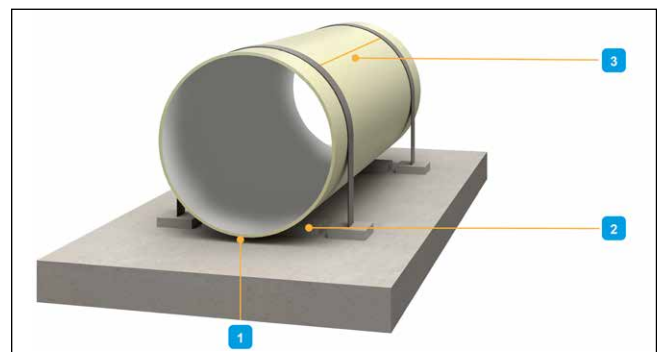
Pipe anchoring without internal support—maximum spacing of straps. See Table 11
